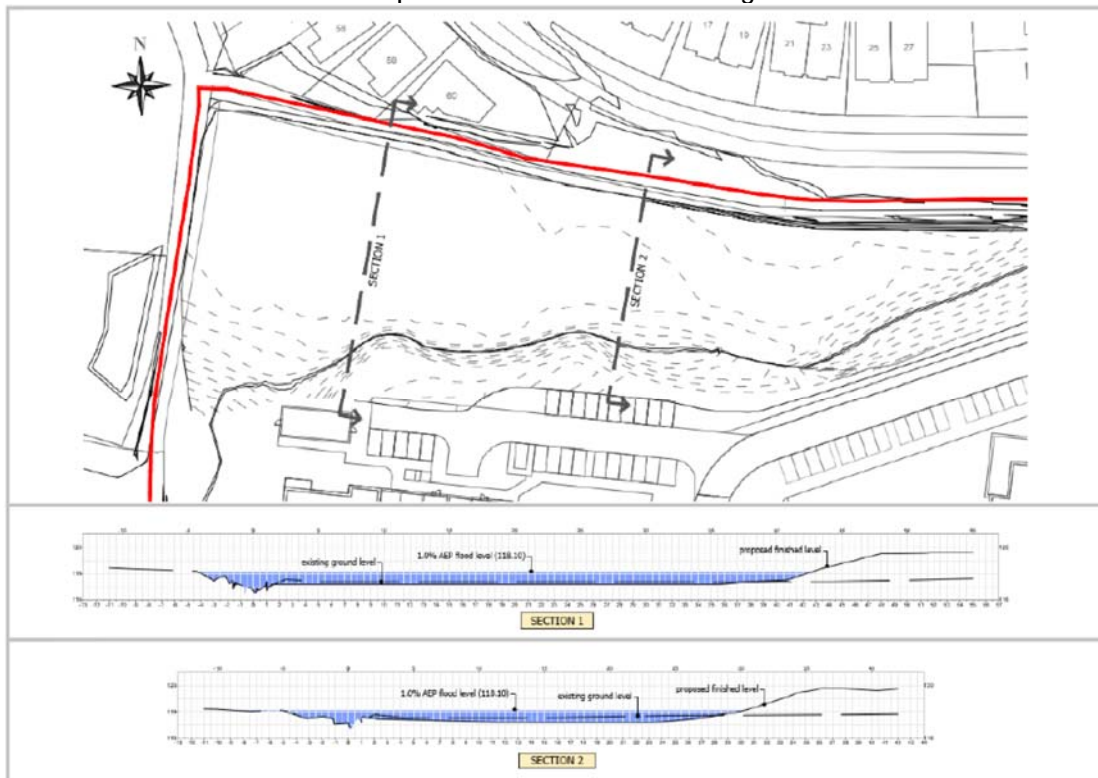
Extract from SSFRA fig.5.3 Plan and Typical Section for Compensatory Basin
